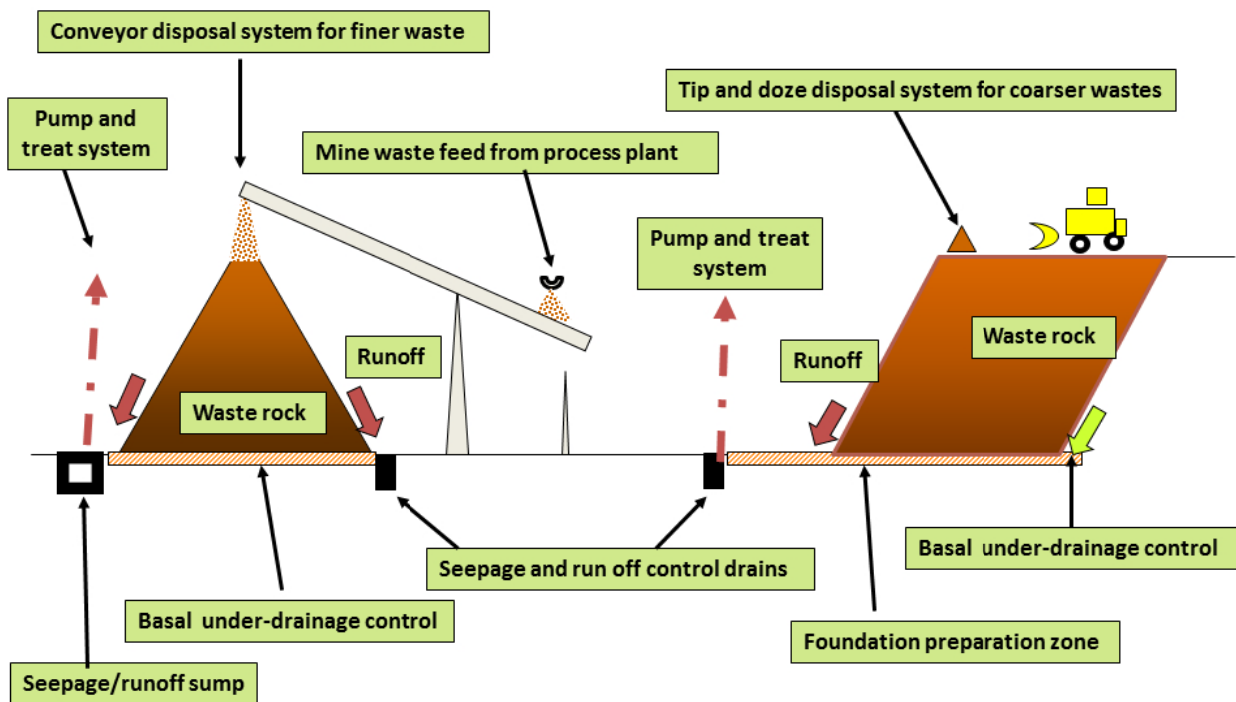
Two typical sections of waste rock dumps (from Cambridge 2010)
